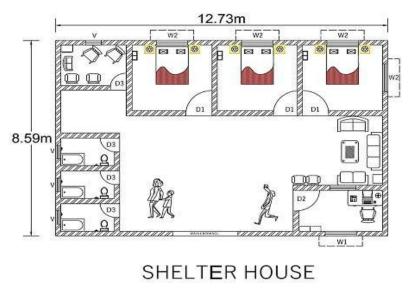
SHELTER HOME PLAN WITH FURNITURE
